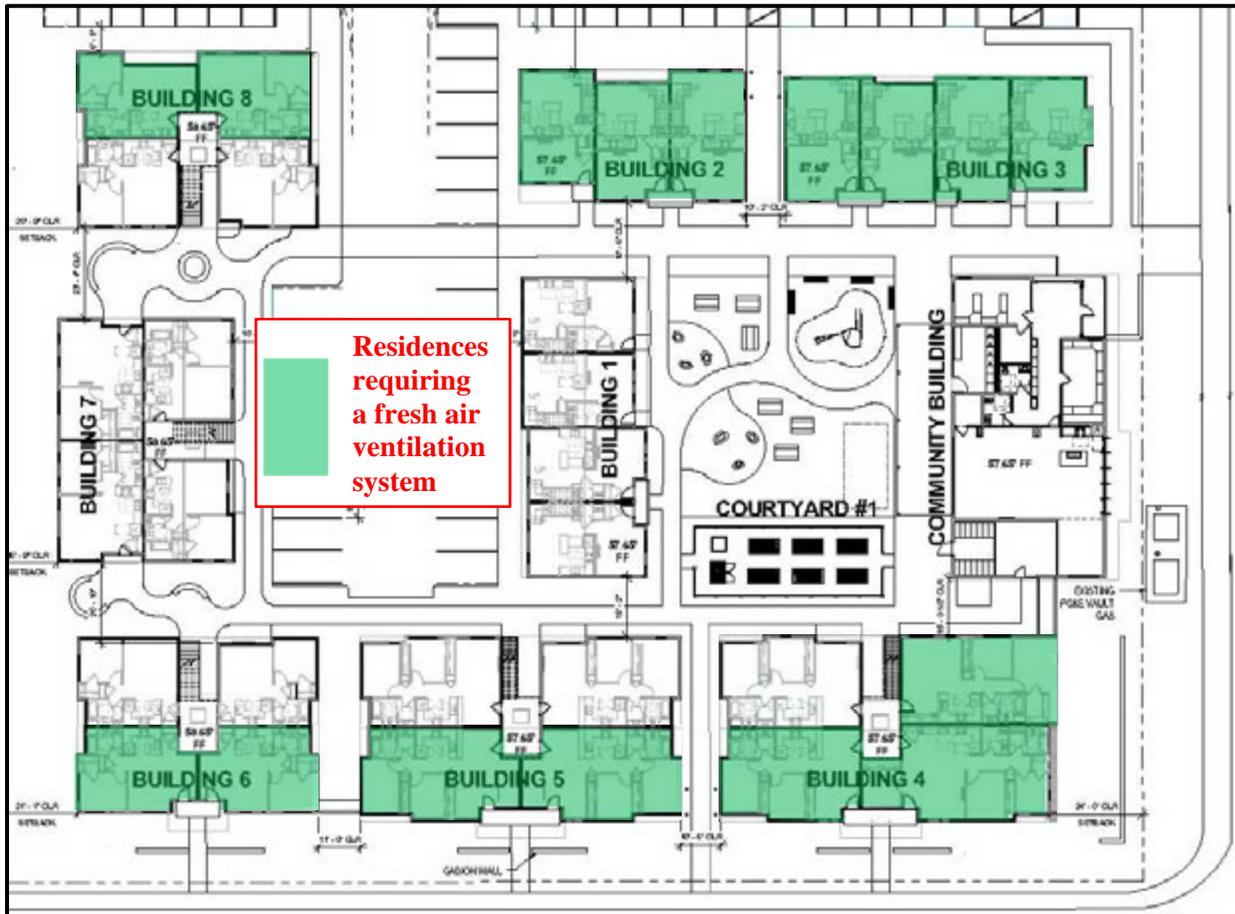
Project Site Plan with Needed Interior Noise Mitigation
